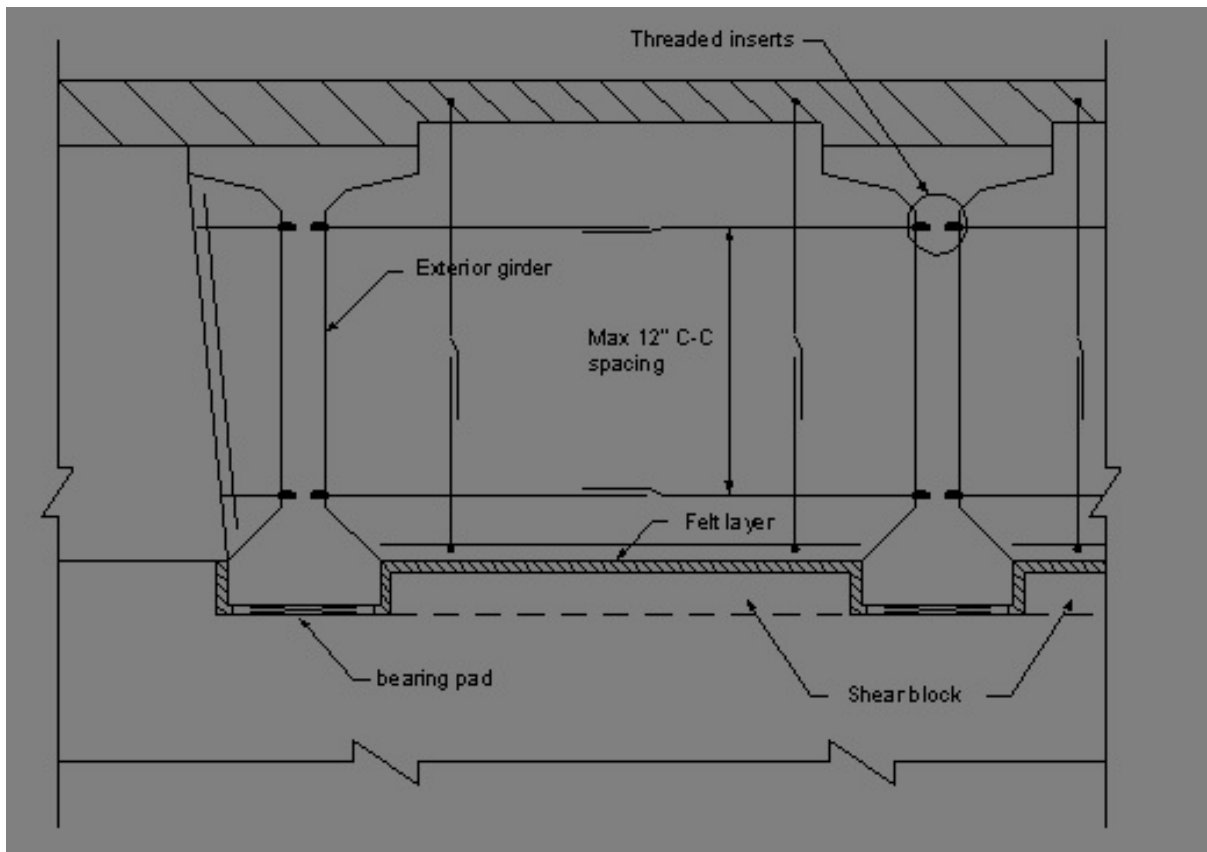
Typical Detail of Bridge Girders and Shear Block (Source: Florida DOT)
